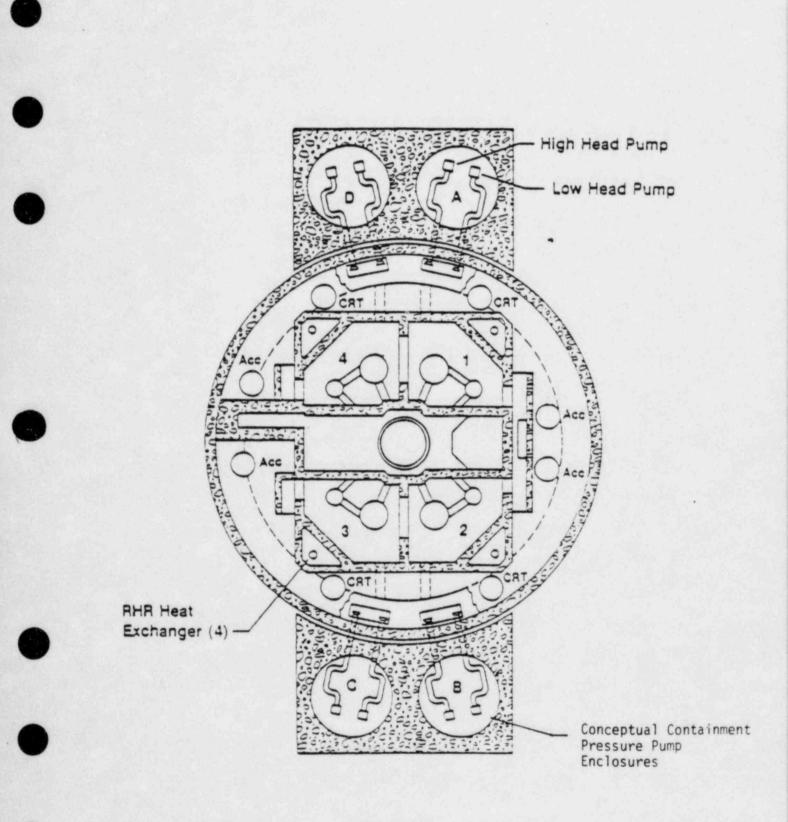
CONCEPTUAL CONTAINMENT PLAN
